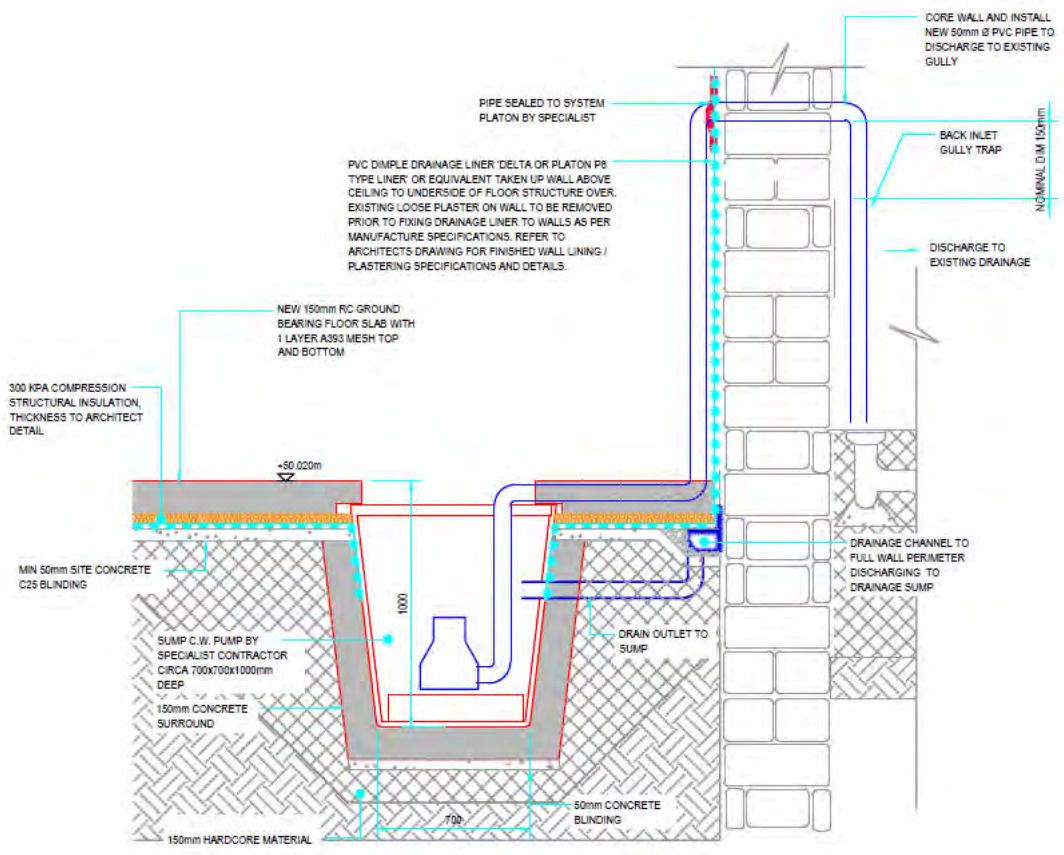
Drainage Sump Detail to Internal Flood Resilient Drainage Liner System
